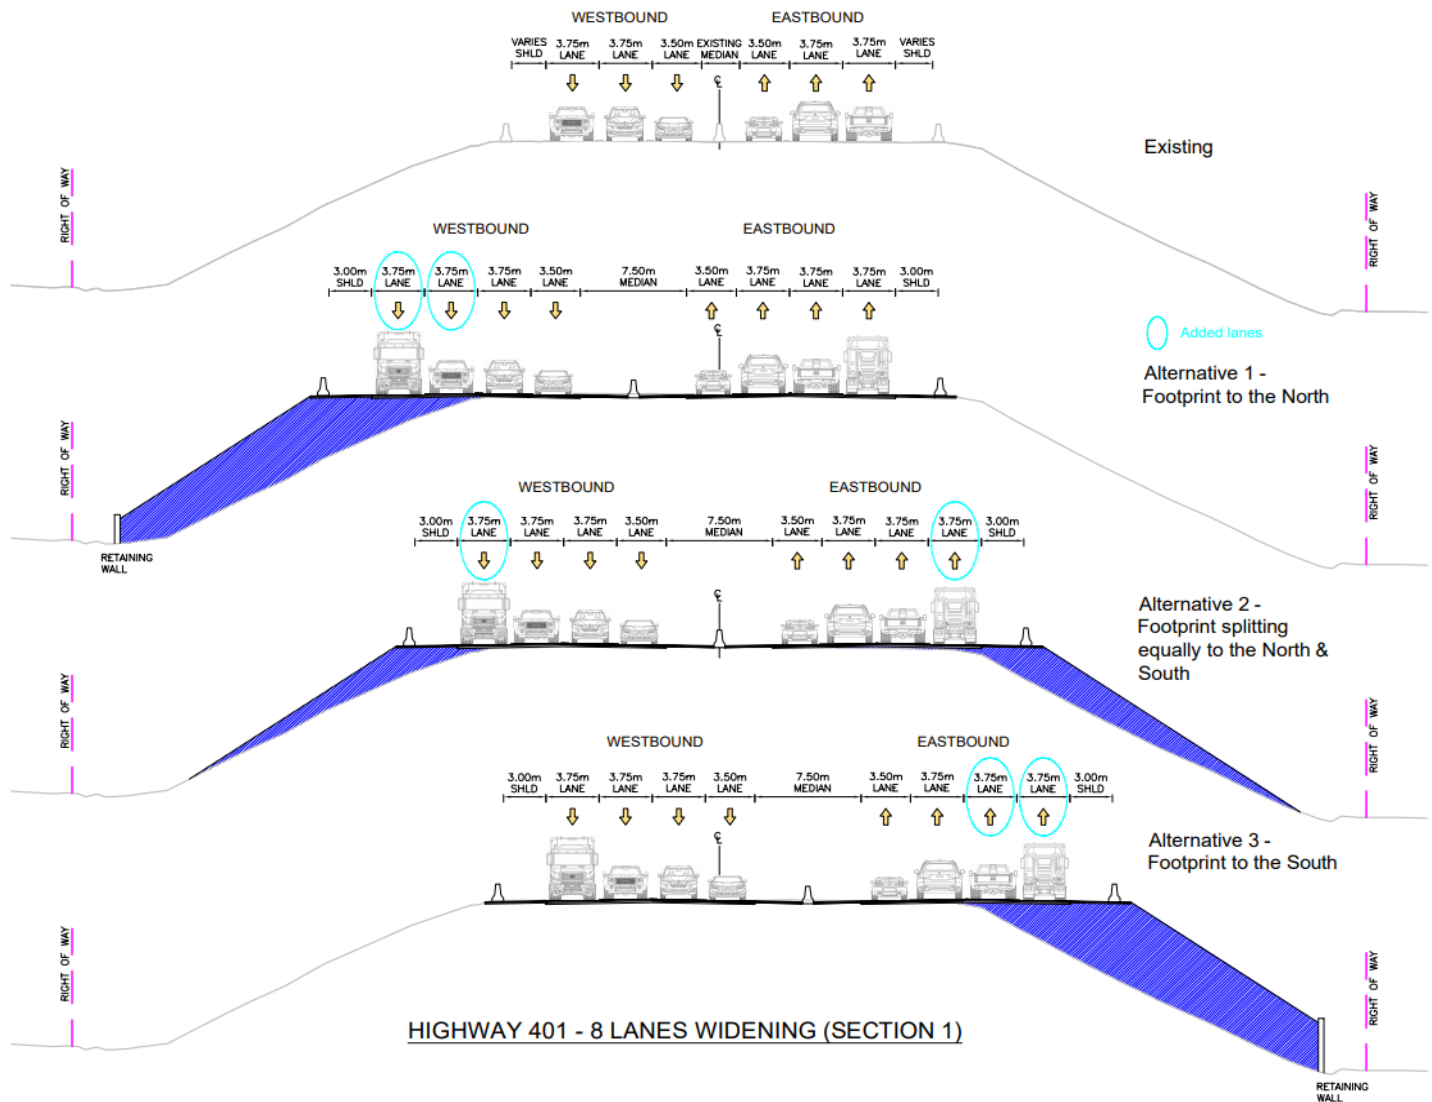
Section 1 – Existing Cross-Section and Future Footprint Alternatives Considered
